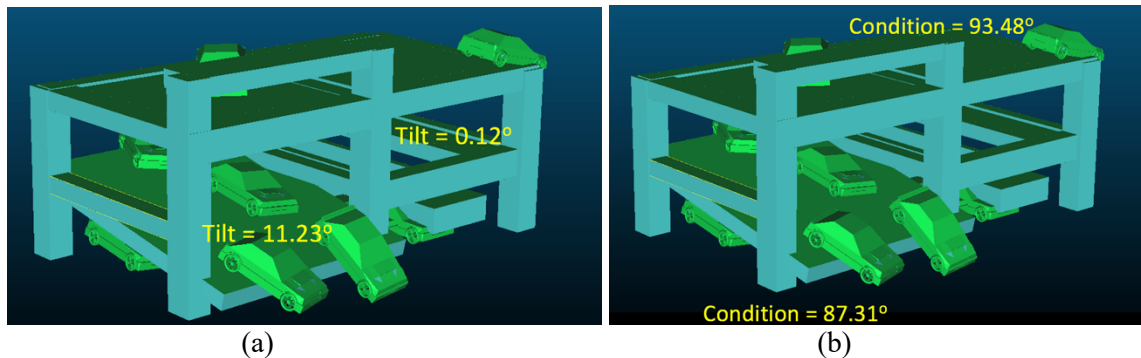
(a) Tilt estimation and (b) damage estimation for a damaged parking deck structure at Guardian Centers
